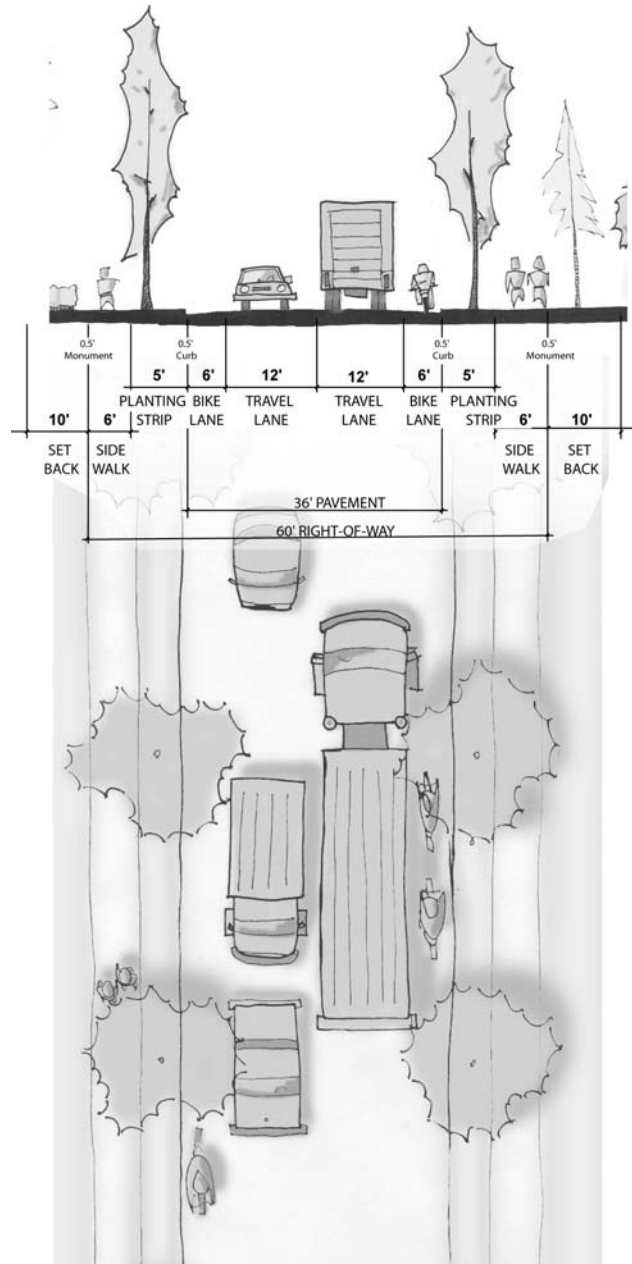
Collector Street Profile – Porter Street South of Primrose
